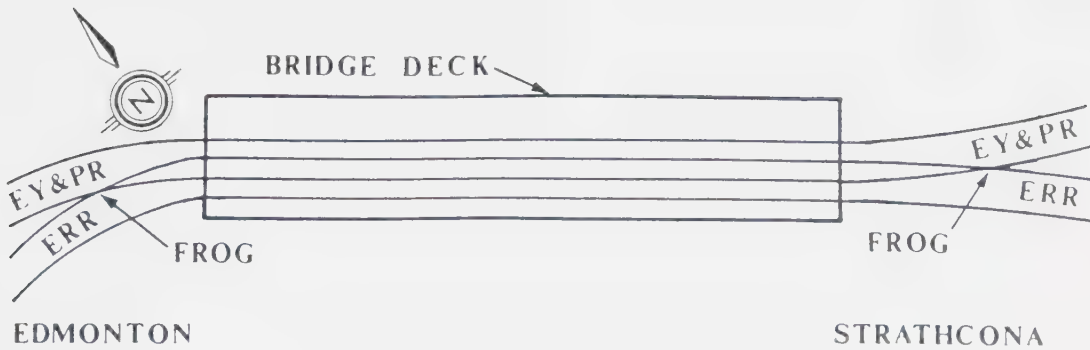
PLAN OF GAUNTLET TRACK ON
